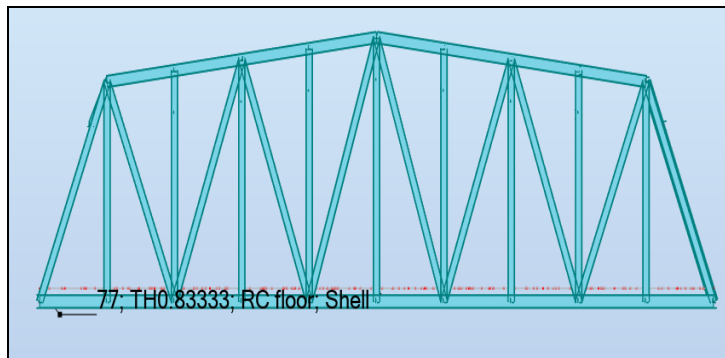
(Front View) 2-D Line Plan of Warren Truss bridge.
